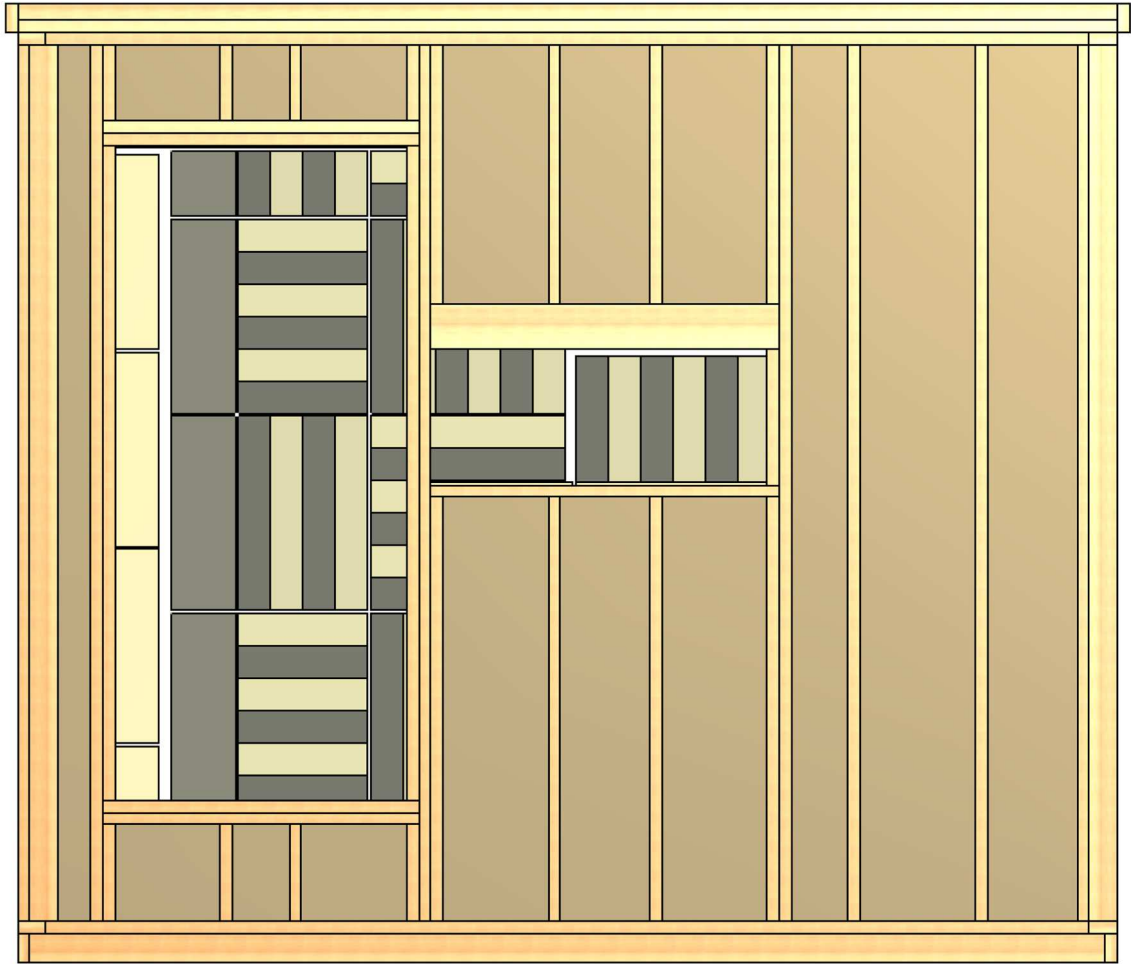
North wall outside structure. This wall contains the door to the facility as well as the large optical access window.
